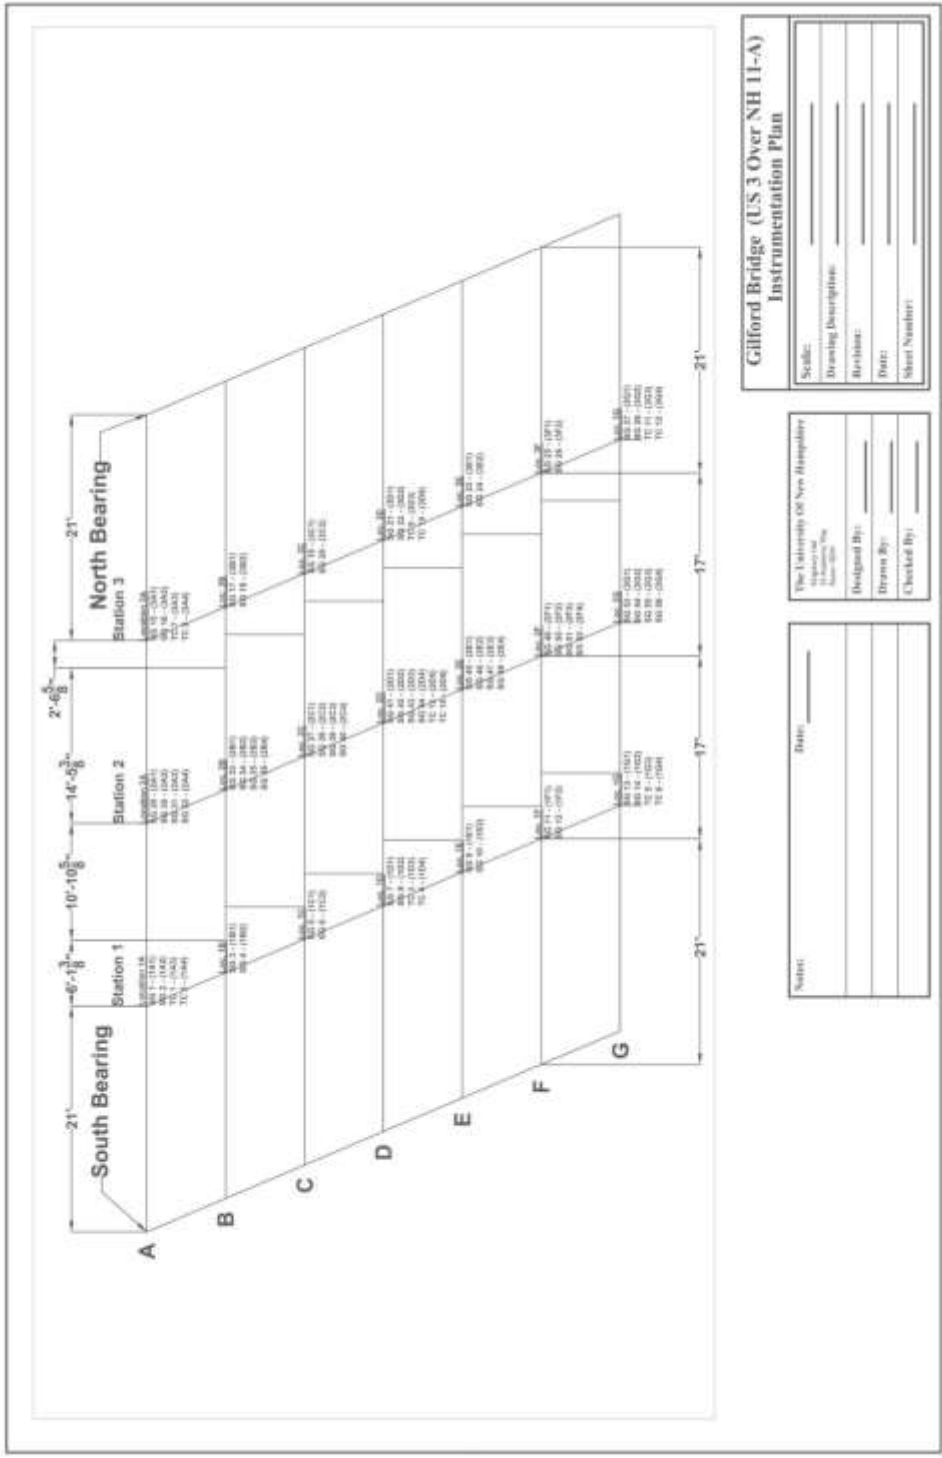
Gilford Bridge – Proposed Instrumentation Plan View
